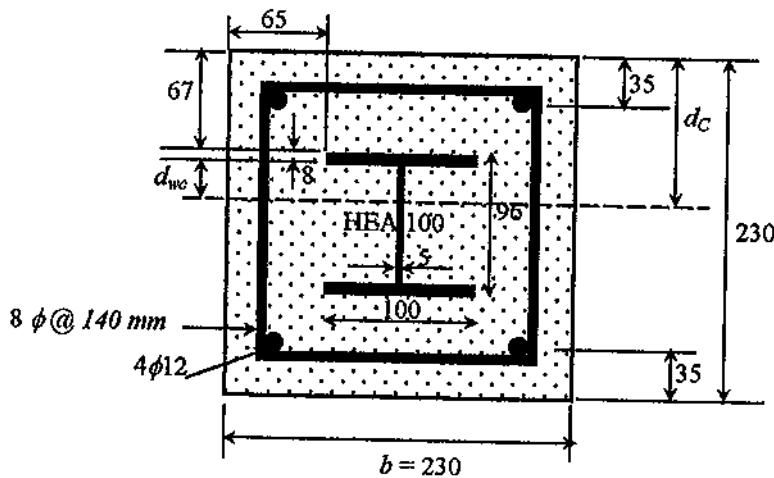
Column Cross-Section of the Example (Column No. 16)
